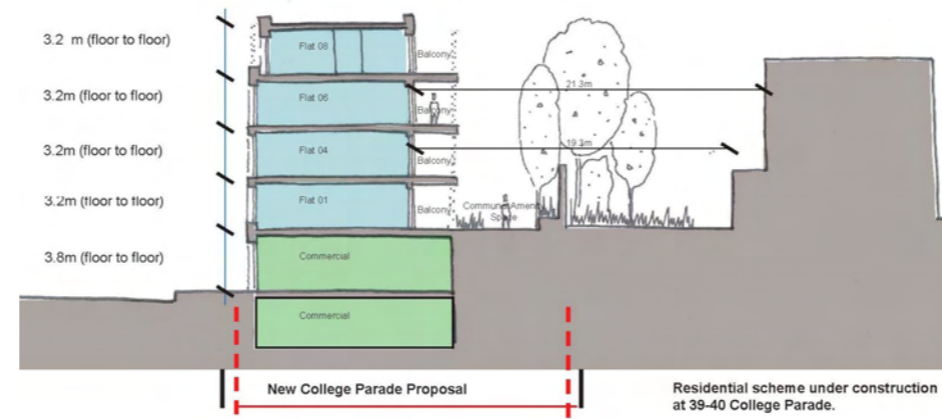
Detail of the proposed Section A-A, showing the proposed floor heights and uses for the development in relation to the consented scheme under construction at 39-40 College Crescent.
